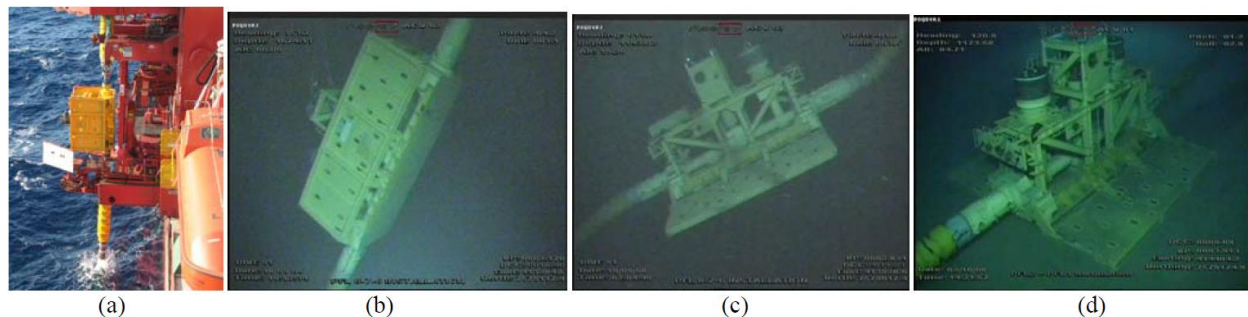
SLED Installation Sequence: (a) – SLED at work table, (b) – SLED lowering, (c) – SLED near sea floor with mudmat opened, (d) - SLED landed
